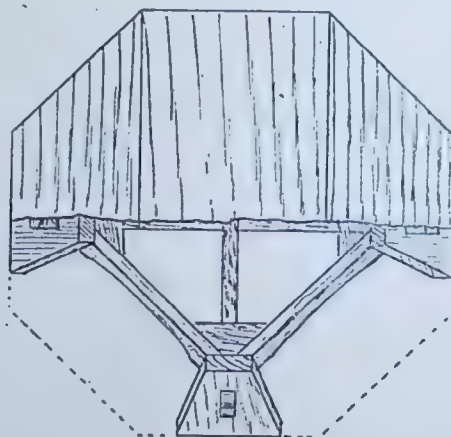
B.—HALF PLAN AND HALF SECTIONAL PLAN.
